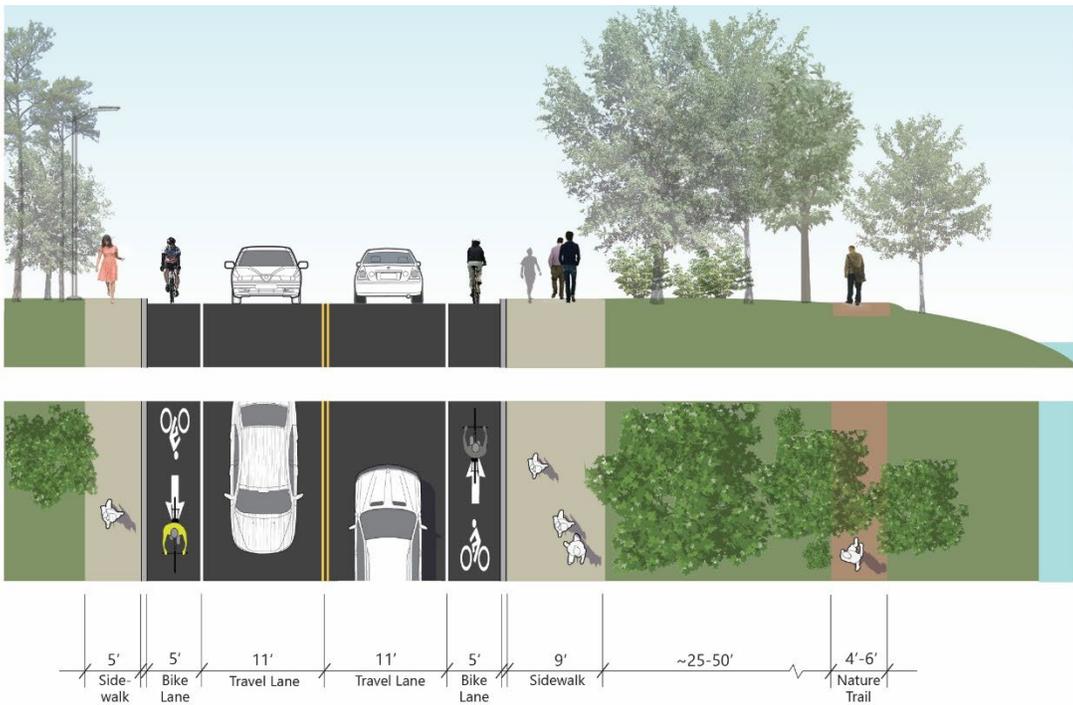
Section A-2: Proposed Straw Point access drive, facing east (DRAFT CONCEPT)
